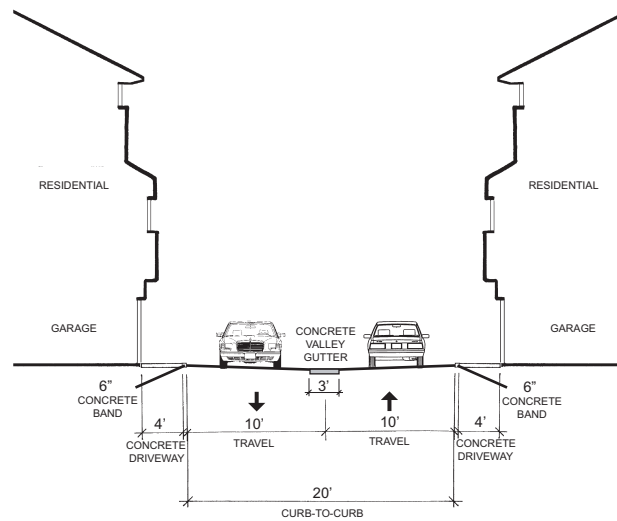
D.39: Cross Section of Typical Private Court Roadway ②
